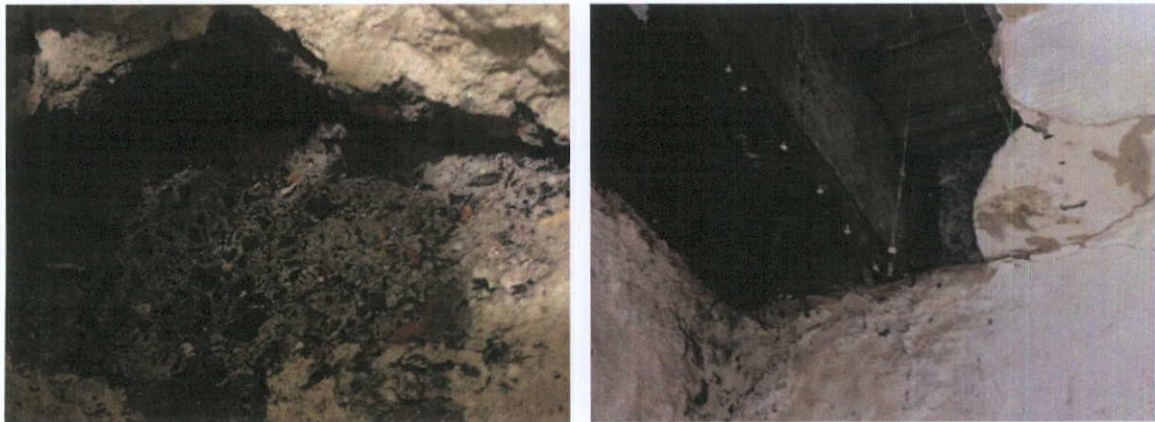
The clinker concrete used to form the rear, party and internal walls is a distinctive mix with coarse angular brick shards as aggregate; and this material was also used for the construction of Nos.4,5 and 6 Moore Street.
